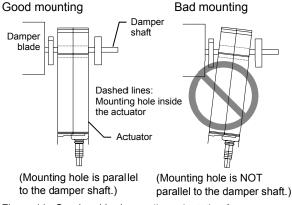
Good and bad mounting orientation for min. 85 mm long damper shaft  Attach the universal bracket (accessory) to the duct. Position the universal bracket so that its mounting screws do not touch the damper blade.
